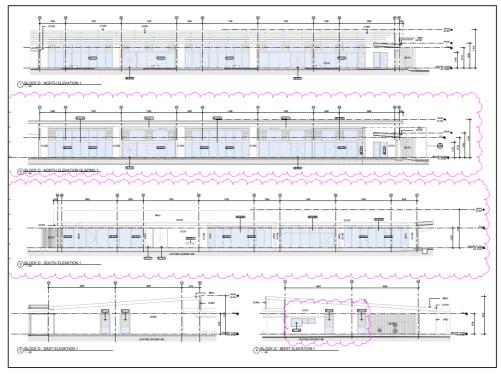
| Block D elevations (Source: Applicant's RtS 2021)
